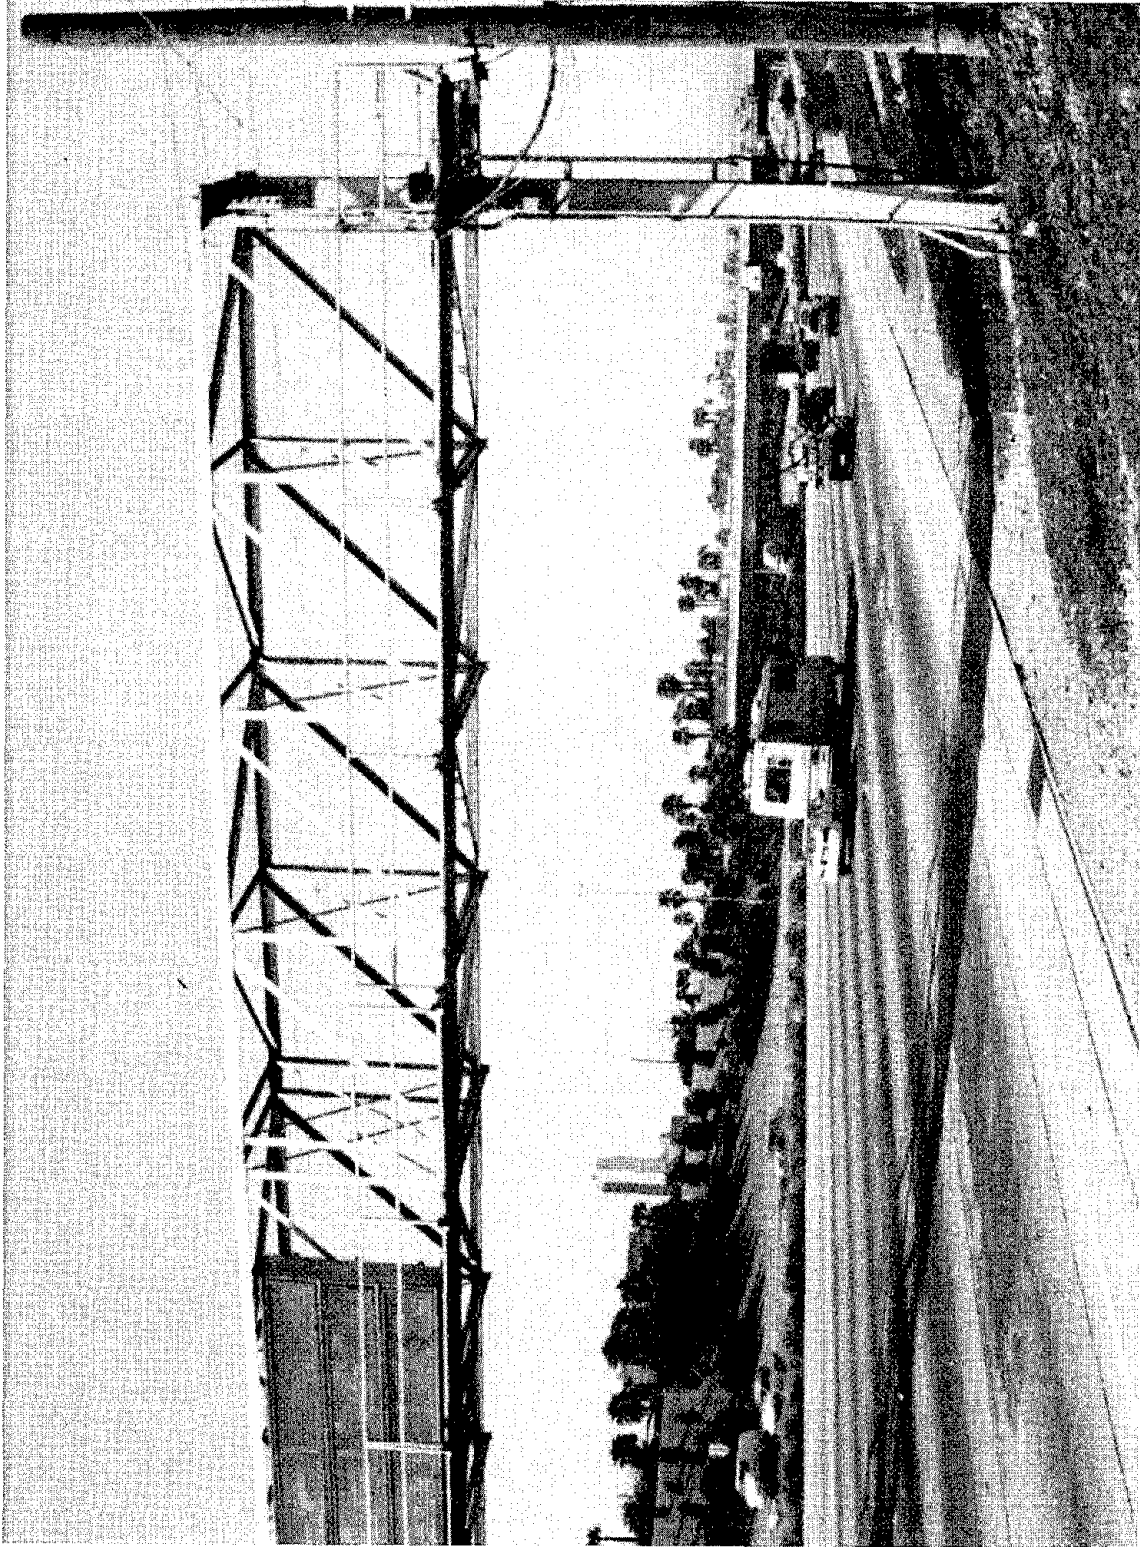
Phoenix Freeway Test Site Photograph Showing Westbound I-10 Traffic at Thirteenth Street
